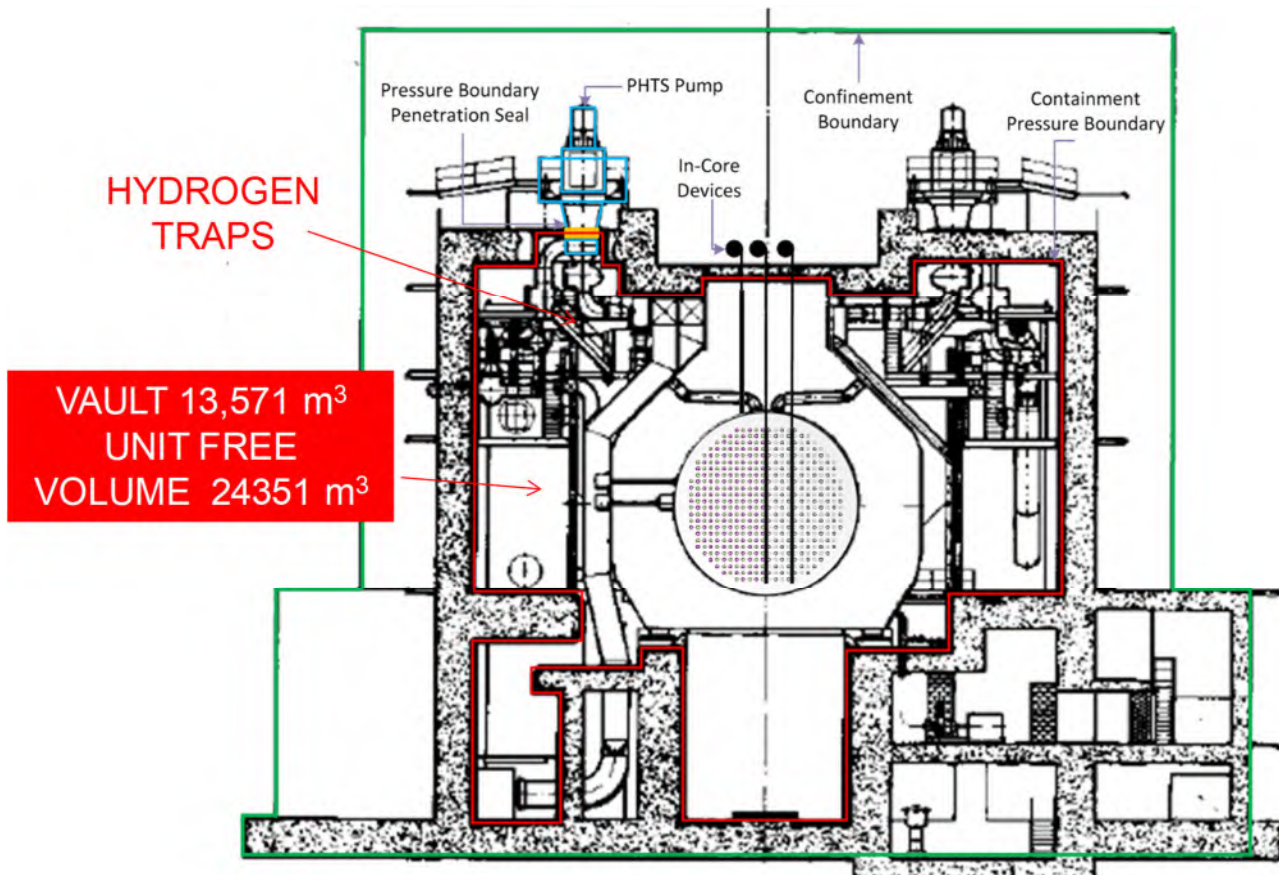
Single unit reactor assembly in a crowded vault with common fuelling machine duct below
